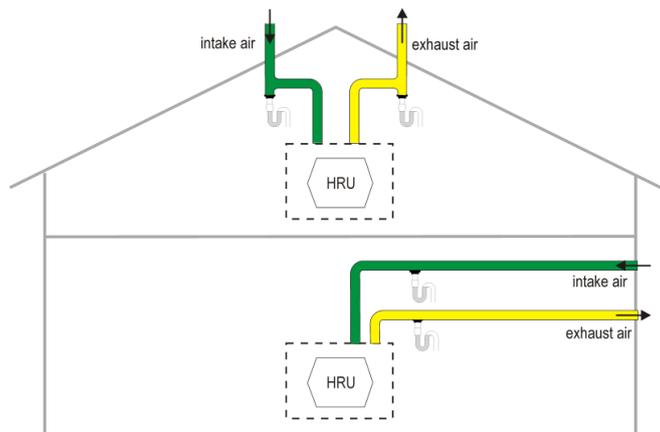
Arrangement drainage of the intake air duct and exhaust air duct
